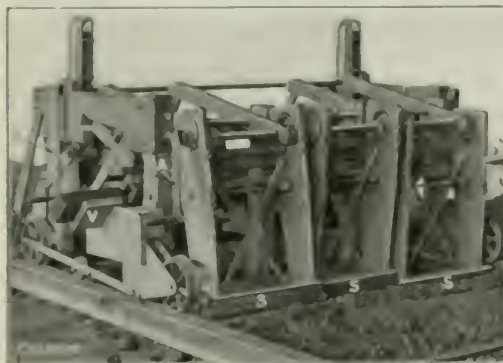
FRONT VIEW OF EXPERIMENTAL PAVING MACHINE INVENTED BY WILLIAM HAYLEY
